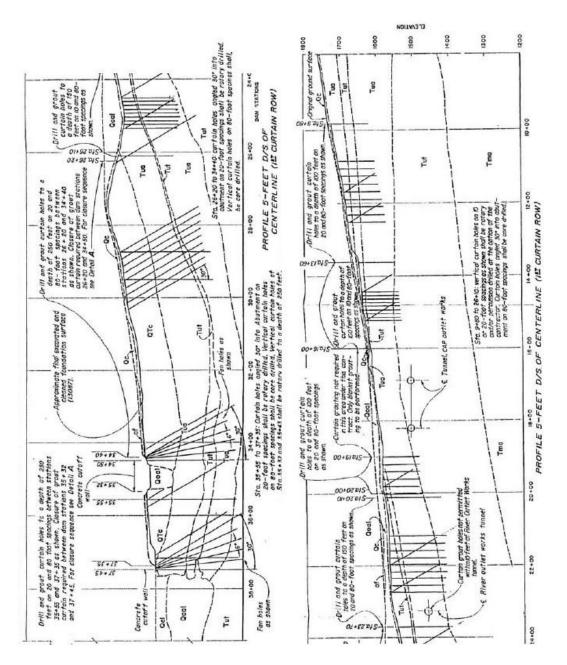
Section view of original grout curtain design at New Waddell Dam
